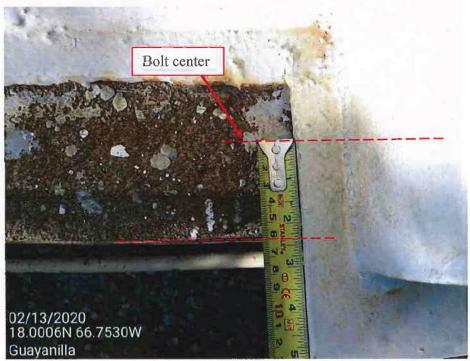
Anchor bolt ripped off from concrete base, due to seismic overturning moment.
